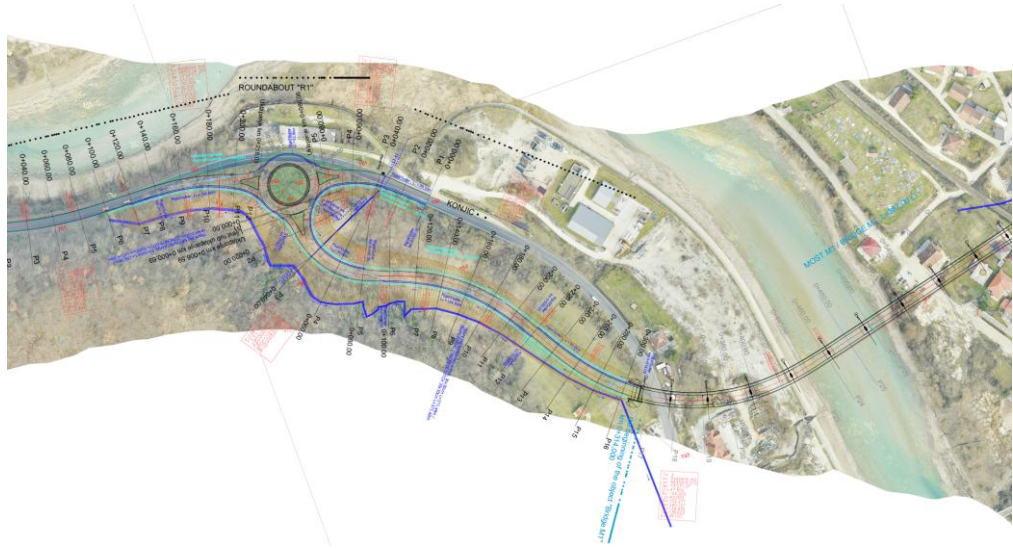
Connection of the Konjic Bypass to main road M17 to Jablanica (source: Preliminary Design)
